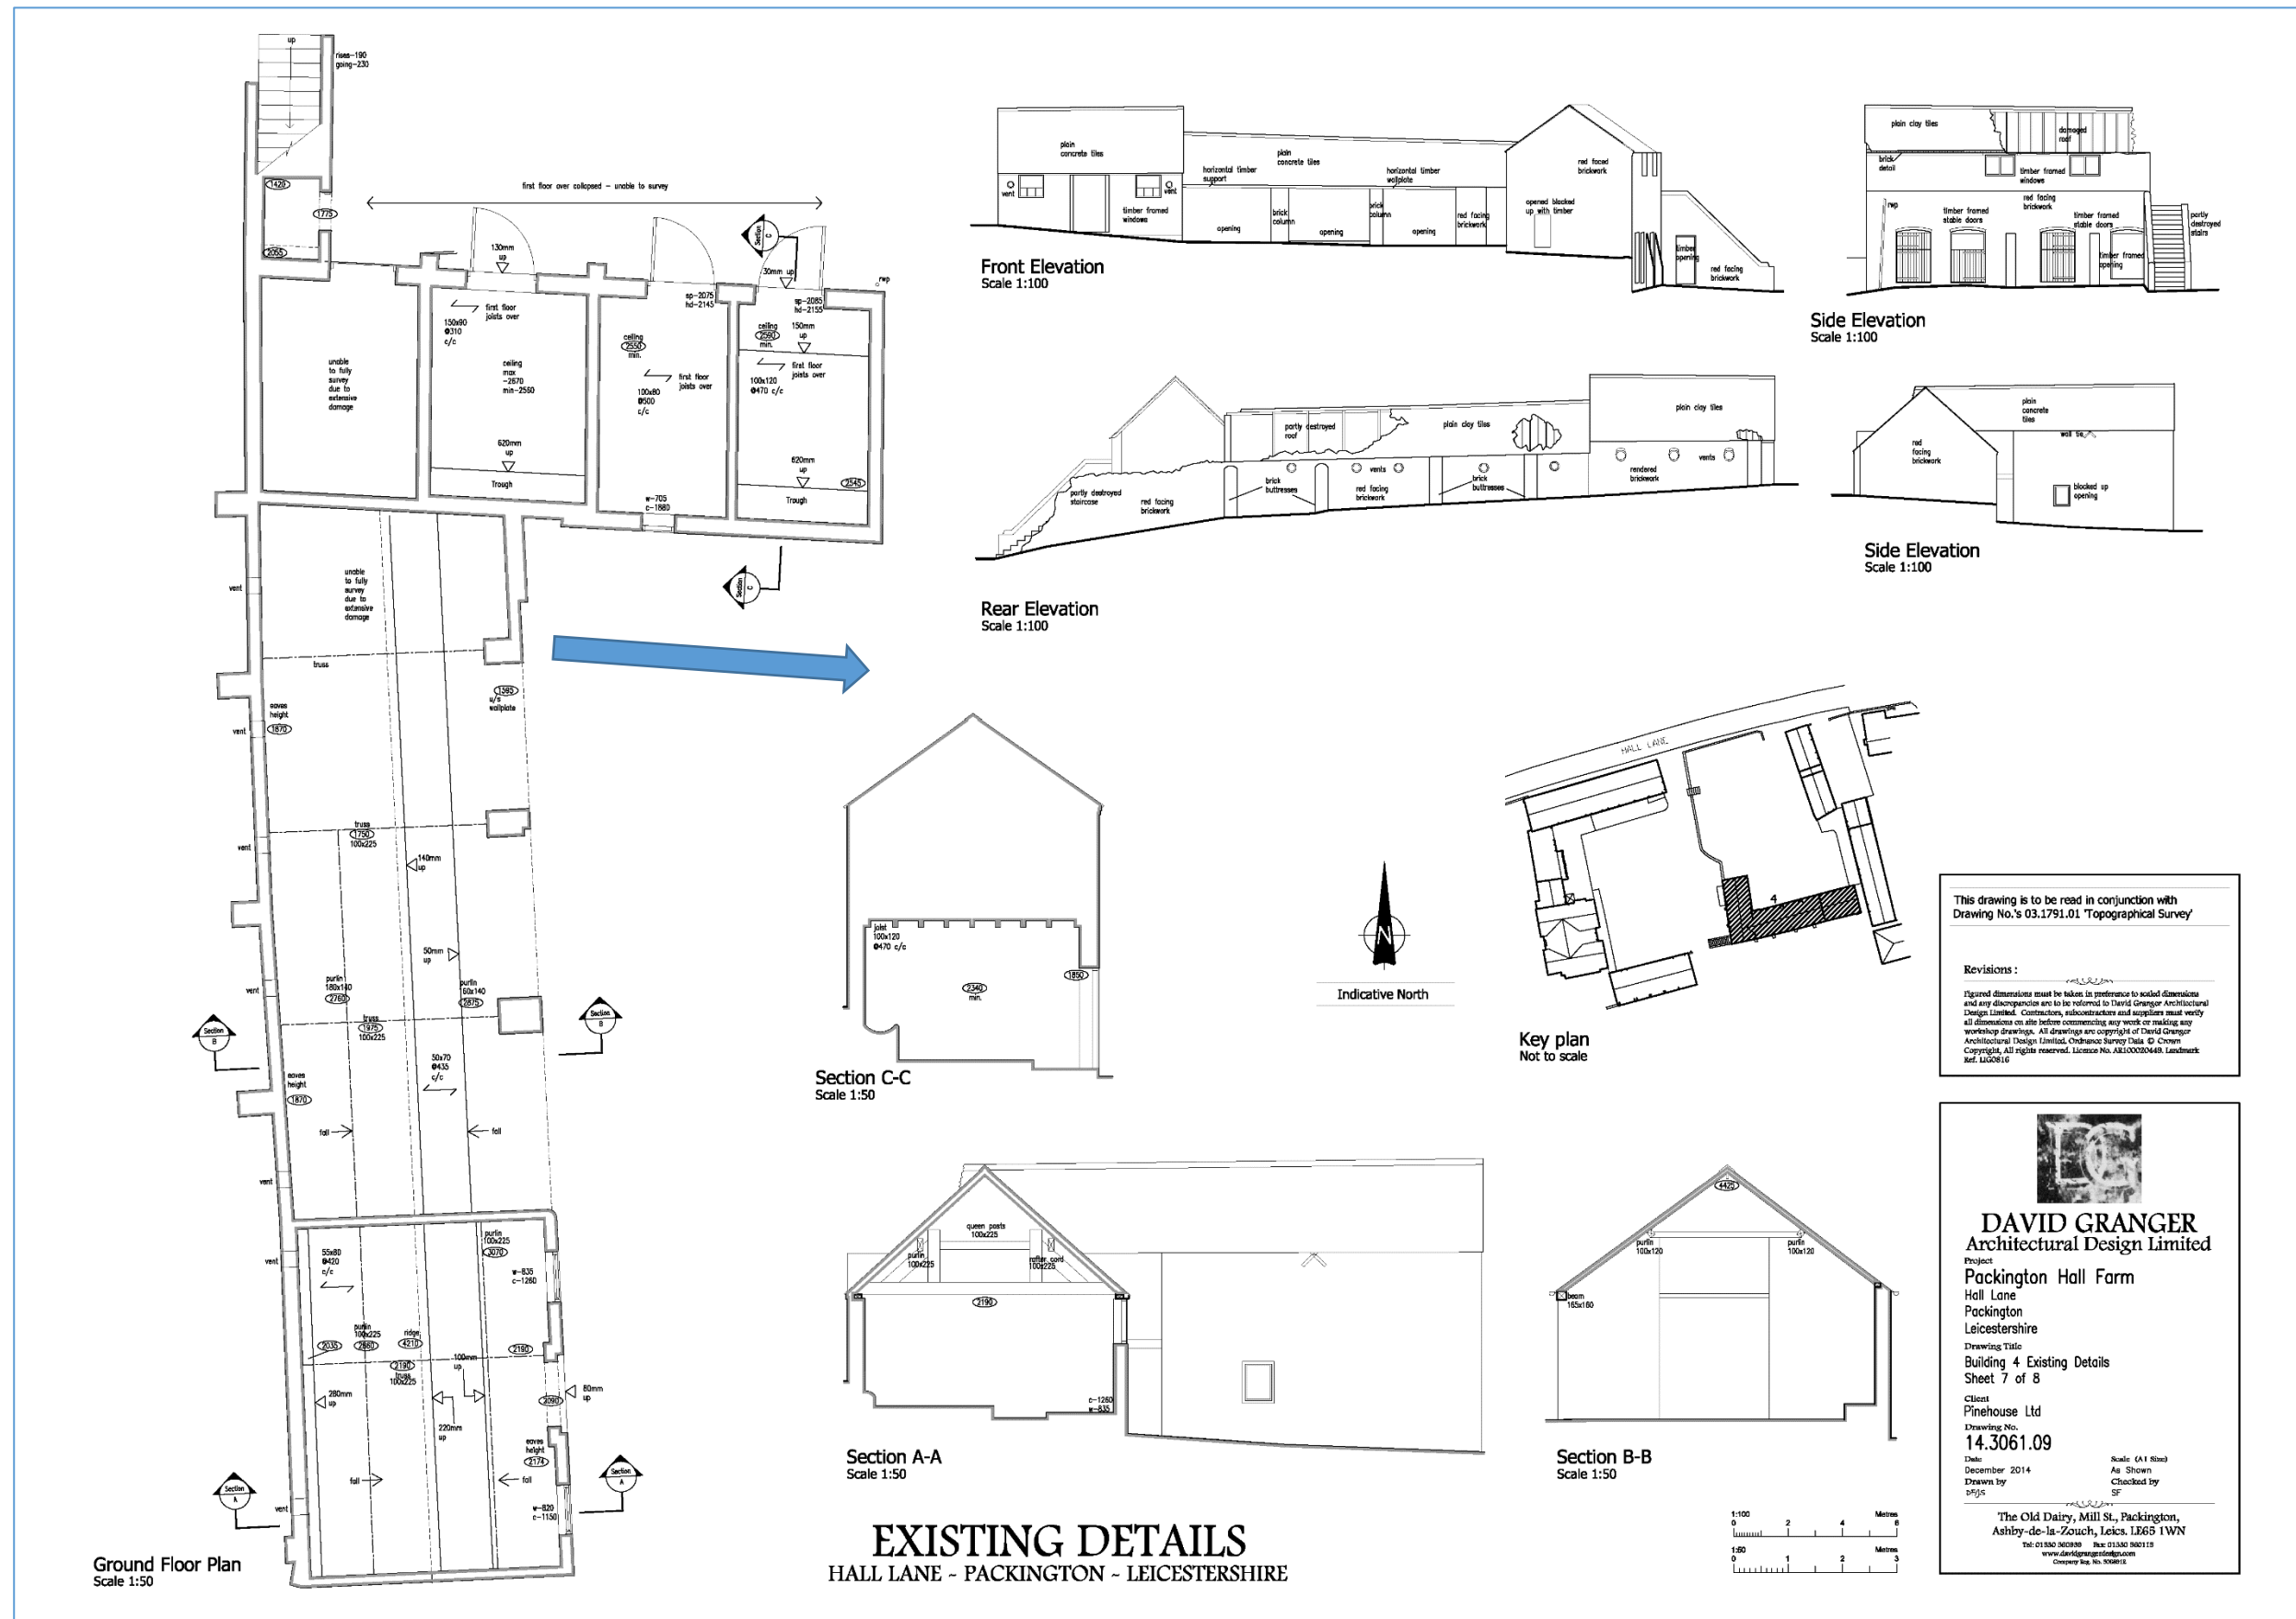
Blocks D, E: floorplans, elevations, sections. Provided by client
